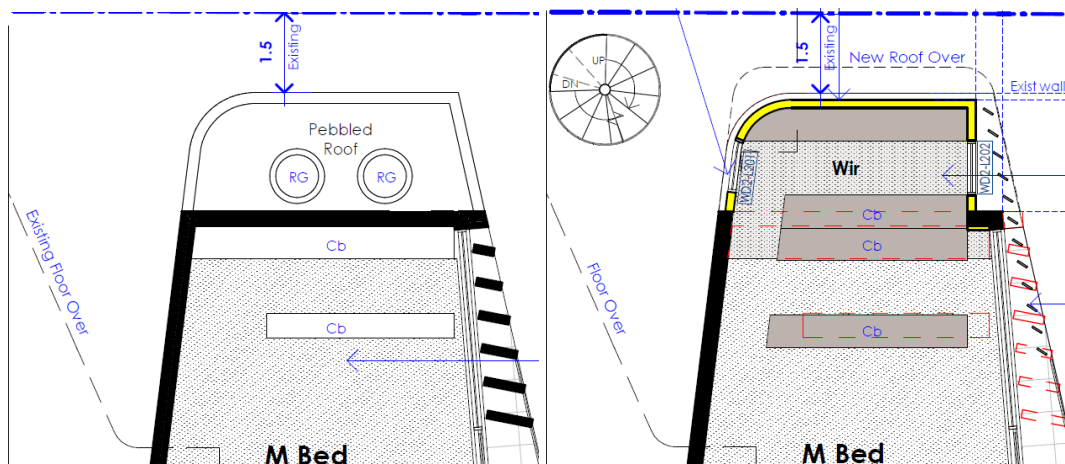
Extract of existing and proposed lower level 2 floor plan prepared by Alec Pappas Architects.
